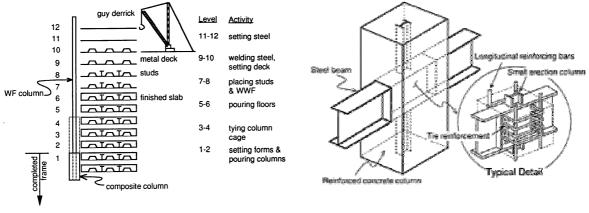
RCS Construction Method for High-Rise Buildings (US Practice)
